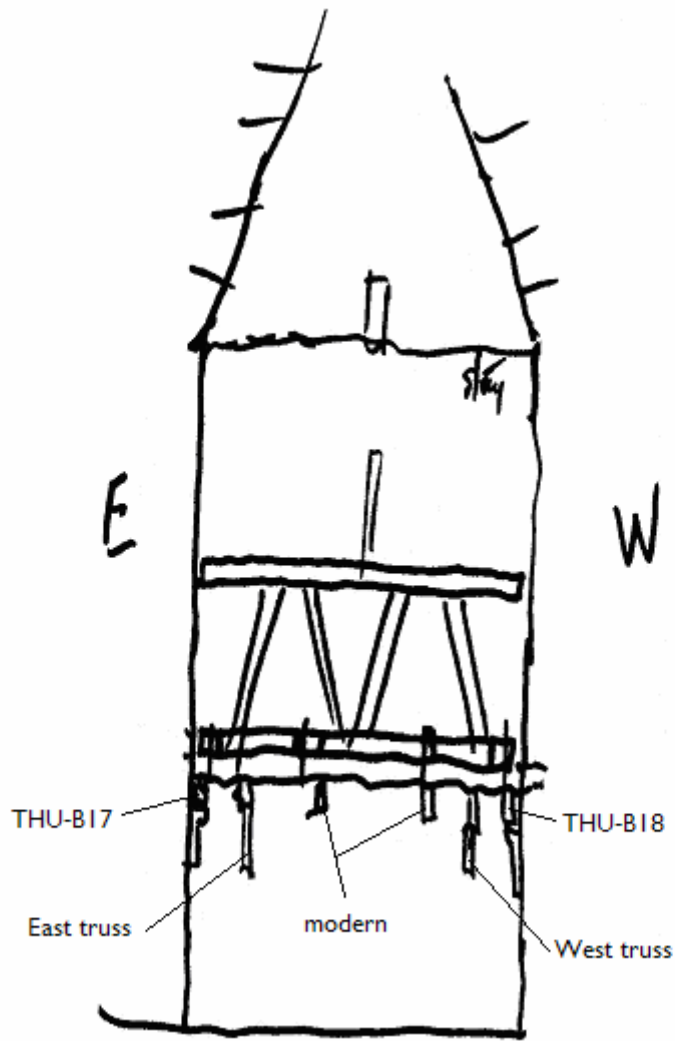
Sketch drawing showing the location of samples THU-B17 and THU-B18 and the position of the east and west truss
